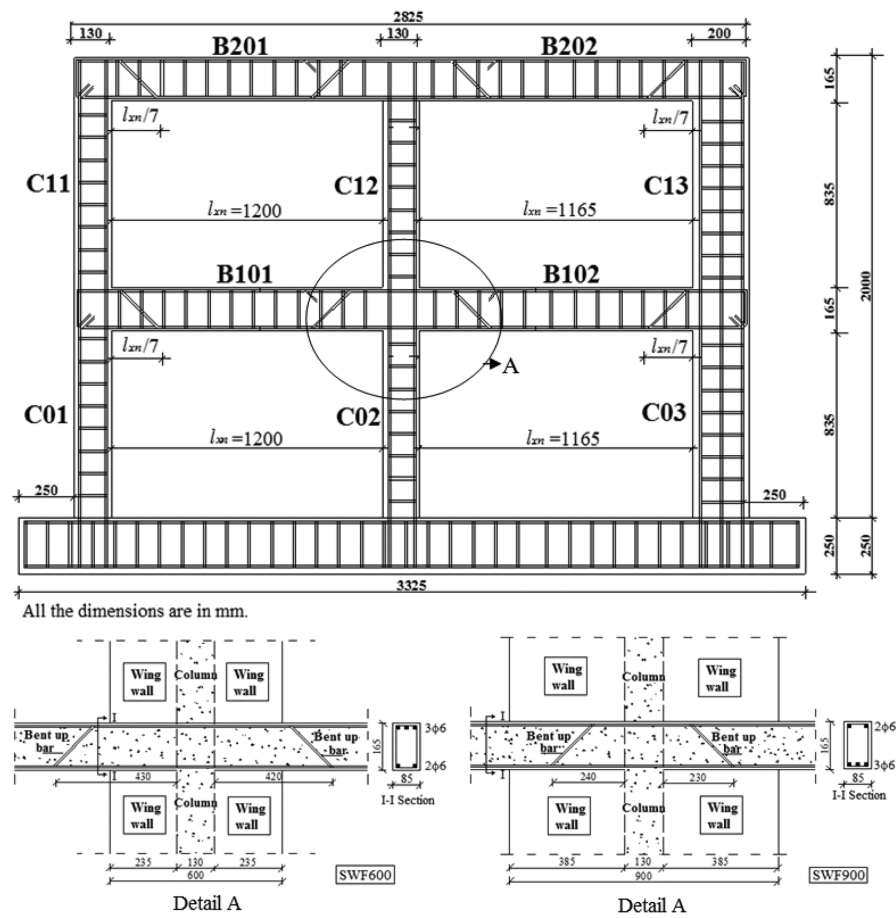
Dimensions and reinforcement details of unstrengthened frames
